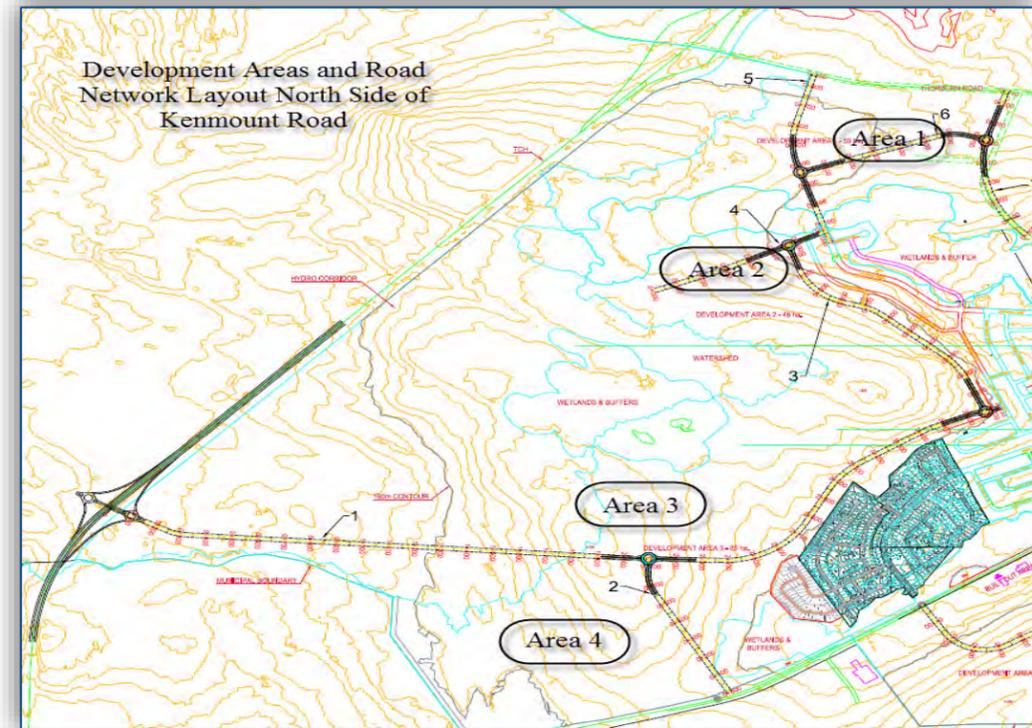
Draft of Network Layout North Side of Kenmount Rd.
